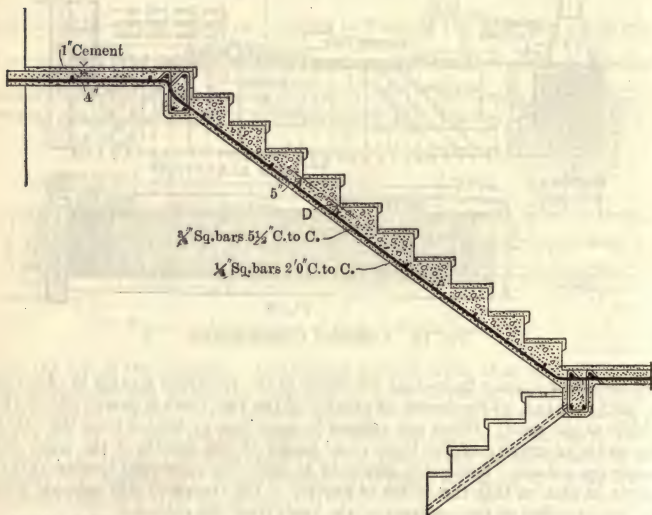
Section through Flight of Reinforced-concrete Stairs
